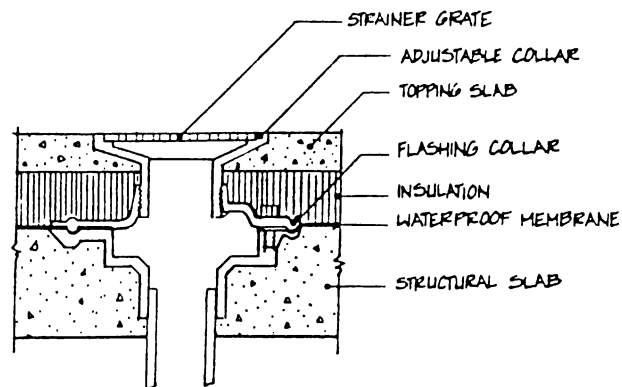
Roof Drain through Topping Slab. Basic method used to drain a roof which has a topping slab protecting the waterproof membrane. Insulation is optional. Common when roof plantings are held in pots or tubs only, or when the deck includes no plantings at all.
